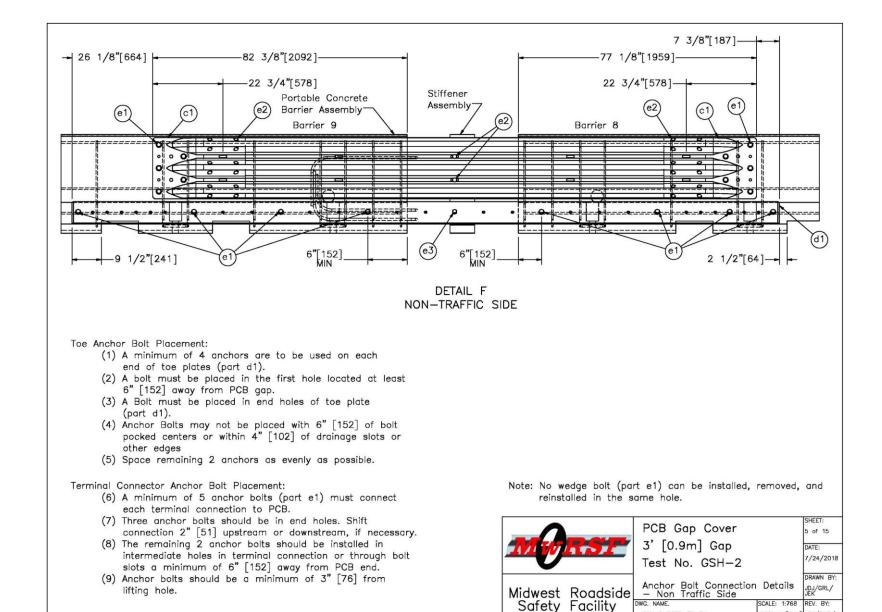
Anchor Bolt Connection Details – Non-Traffic Side, Test No. GSH-2
